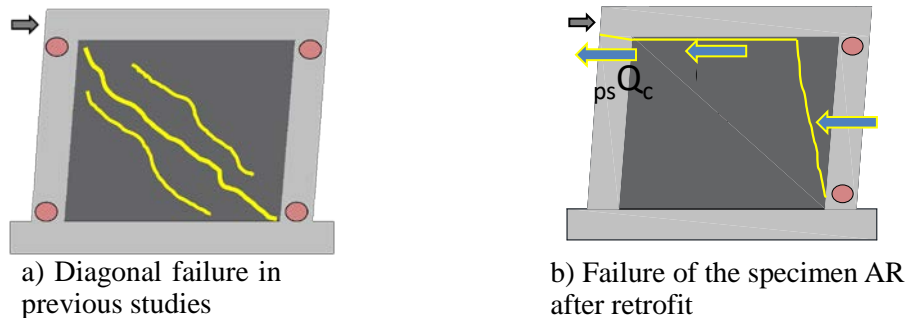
illustration of damage of masonry infill retrofitted by FC
